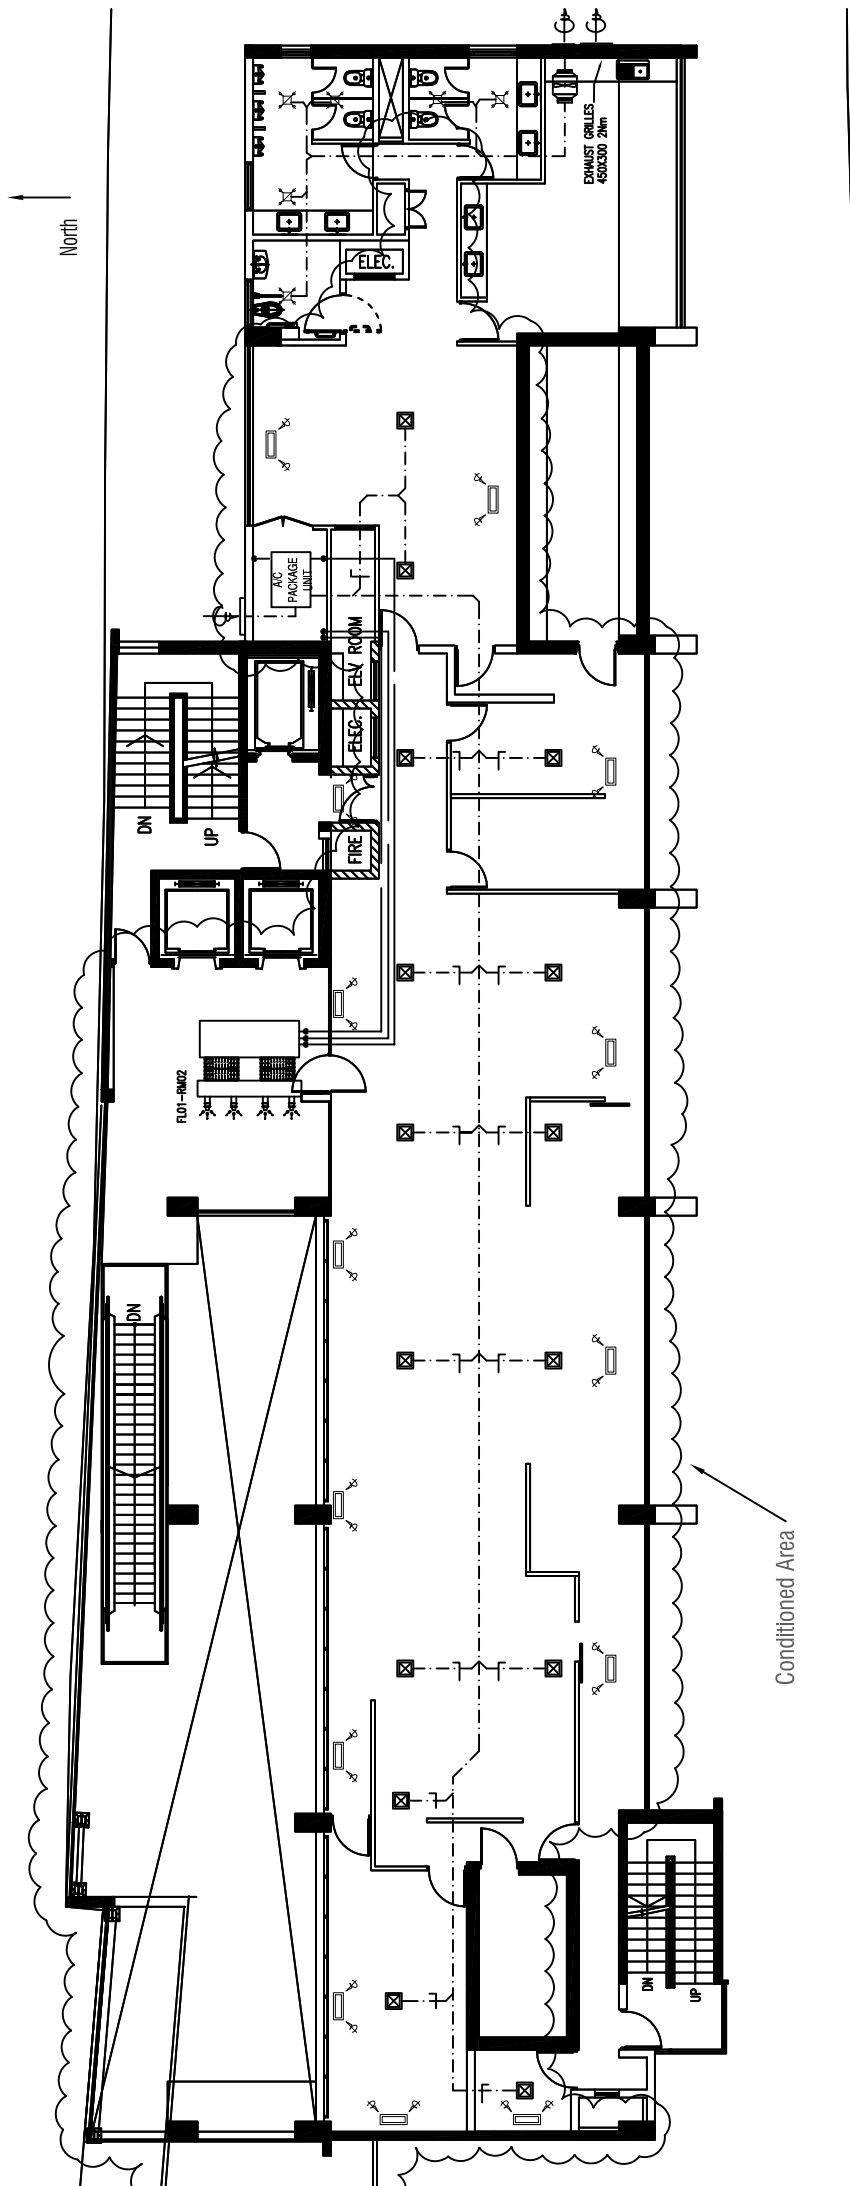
Peoples Leasing Building – 1 to 3 Typical Floor
